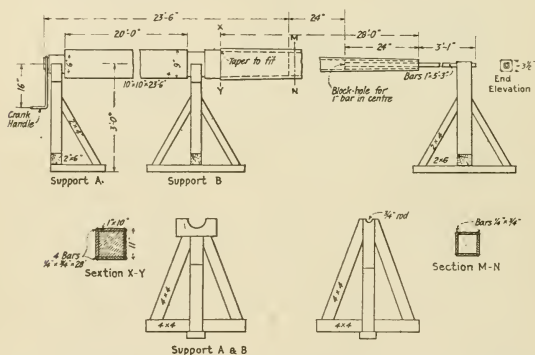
MANDREL FOR WINDING WIRE COIL FOR REINFORCING CONCRETE PILES.
